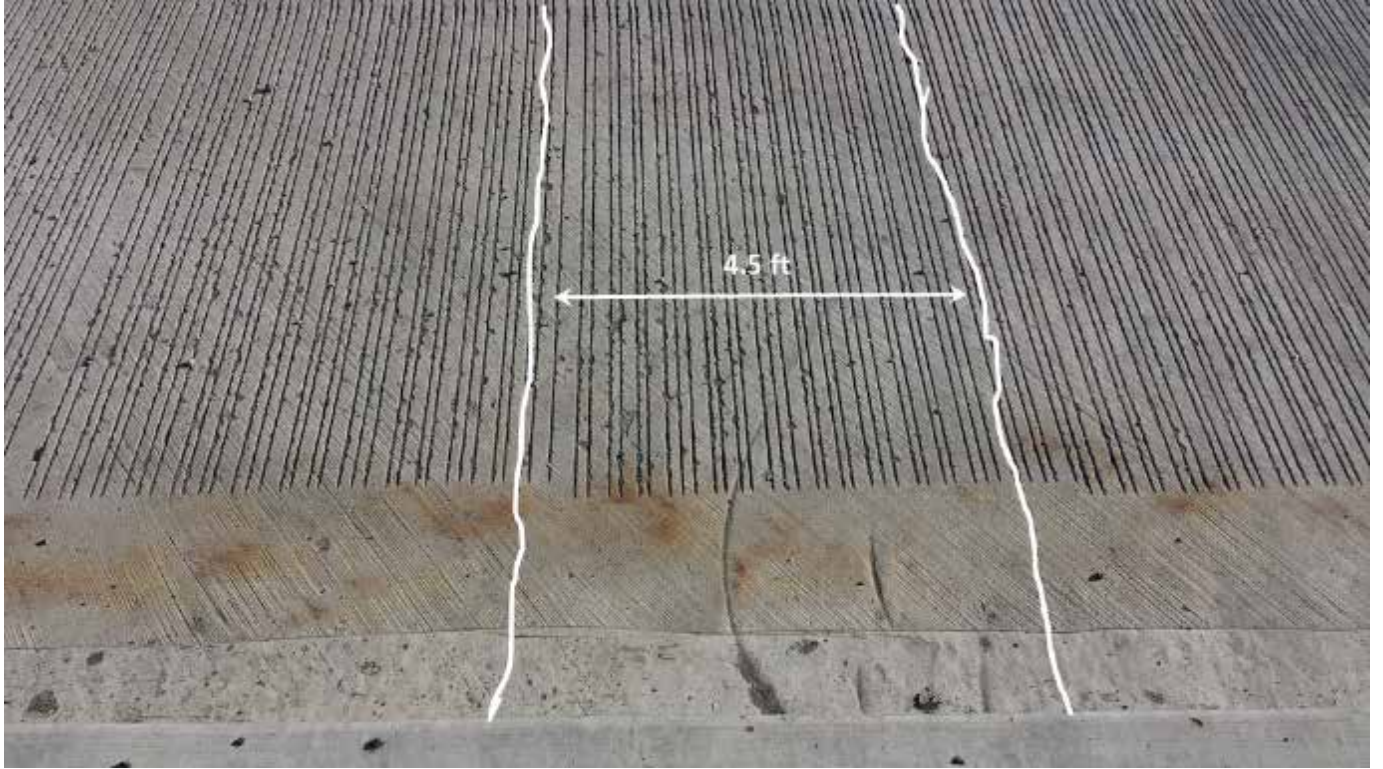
Collings Ave Bridge Deck Cracking - Spacing
